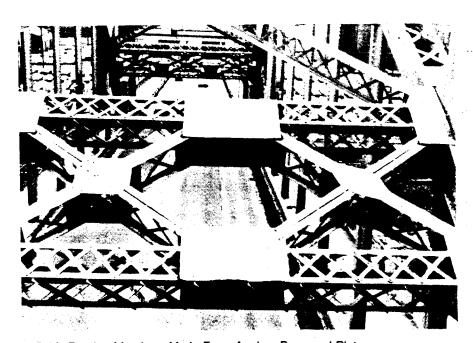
Bracing Members Made From Angles, Bars, and Plates
